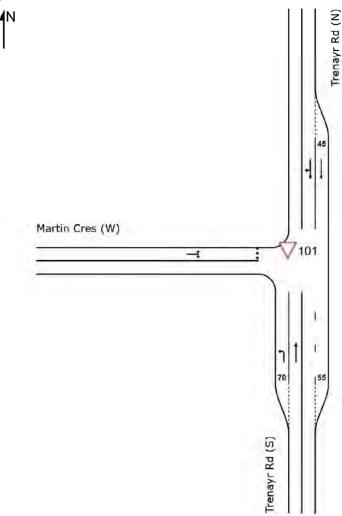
SIDRA Intersection Layout of Trenayr Road / Martin Crescent (Intersection 4)
